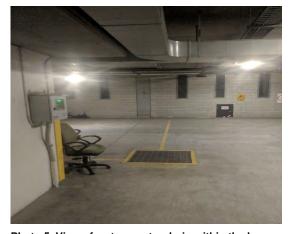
View of a stormwater drain within the basement of 14 Lee Street, Henry Deane Plaza (Dexus Building).
